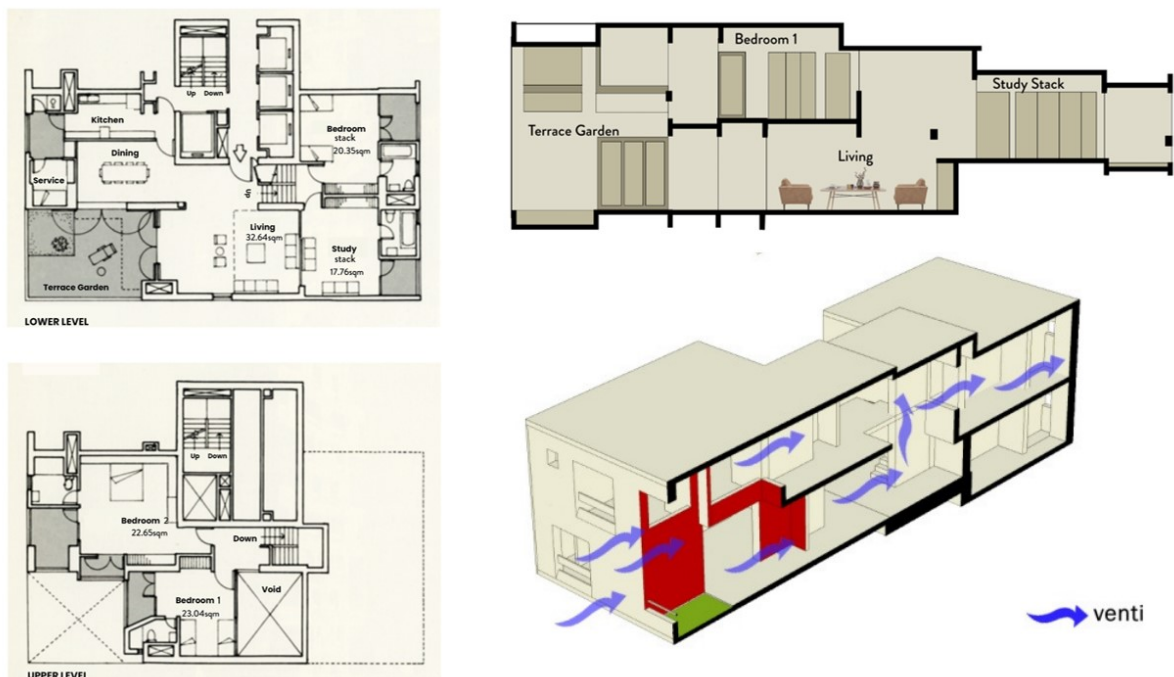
Unit A detailed floor plan and Section (Archsociety )
